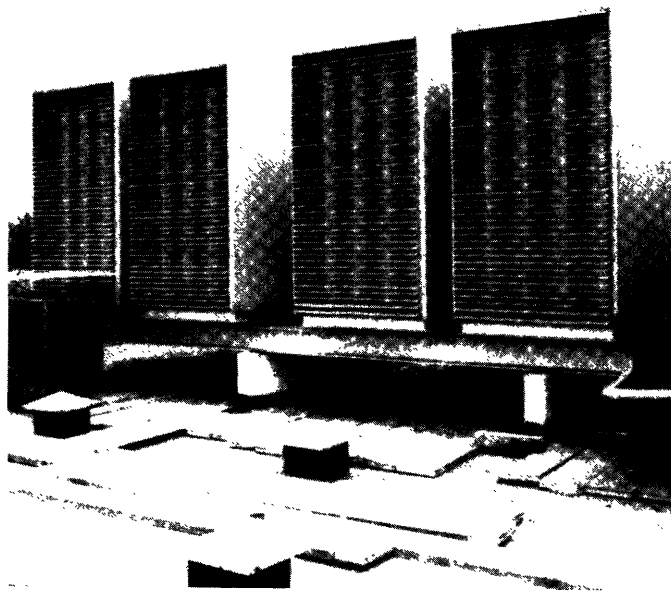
Air heat exchangers on the roof of the apartment building
